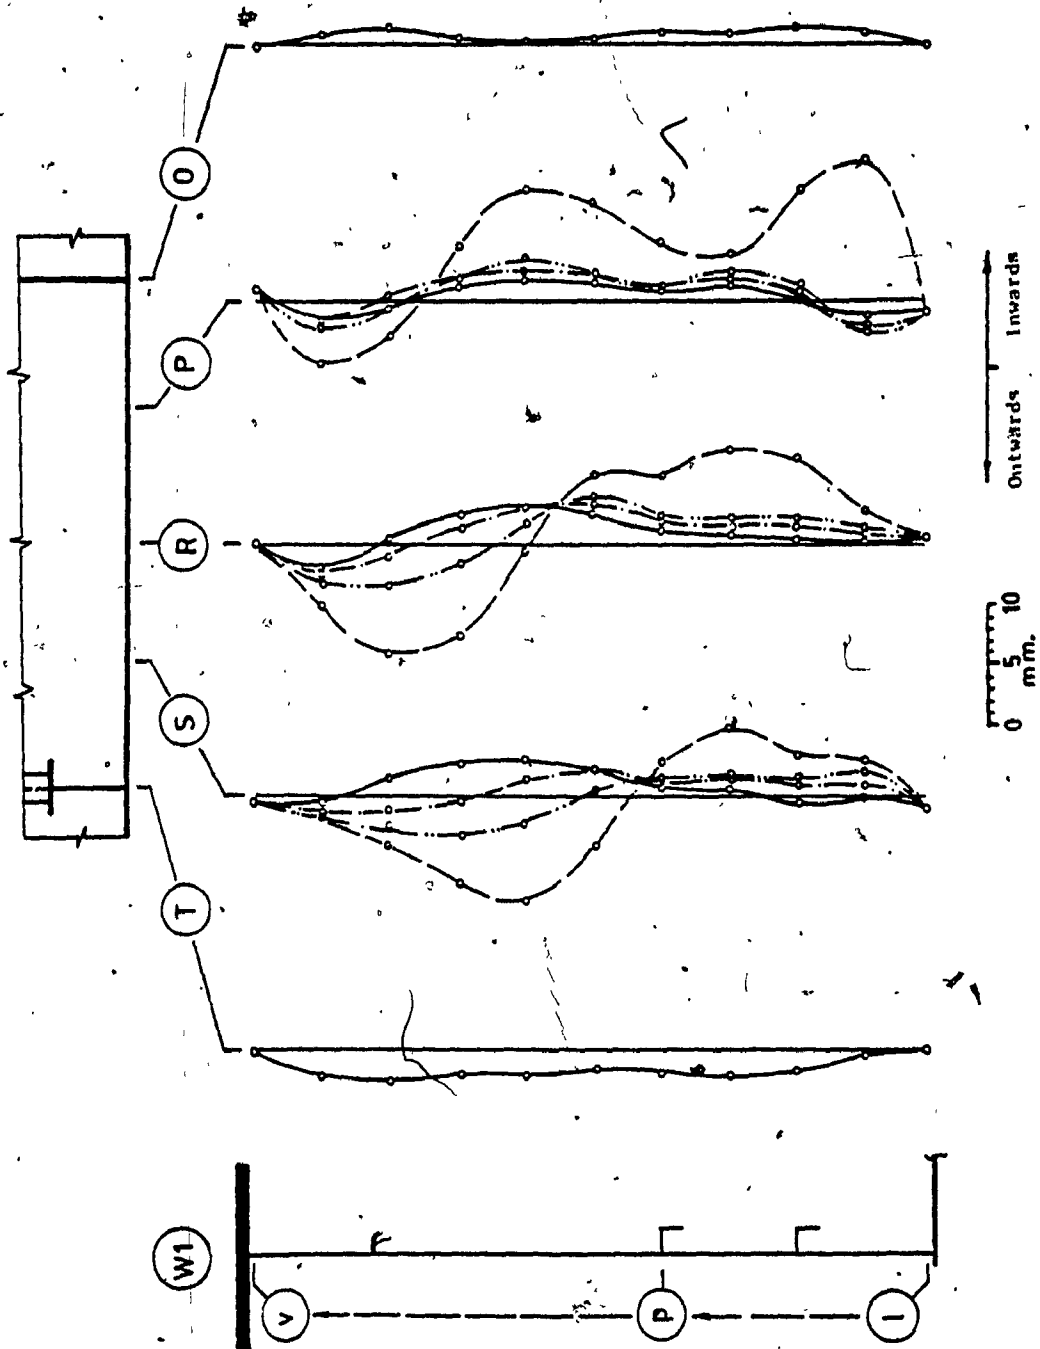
a Cantilever A. Deflections of Web W1 Under Load.
